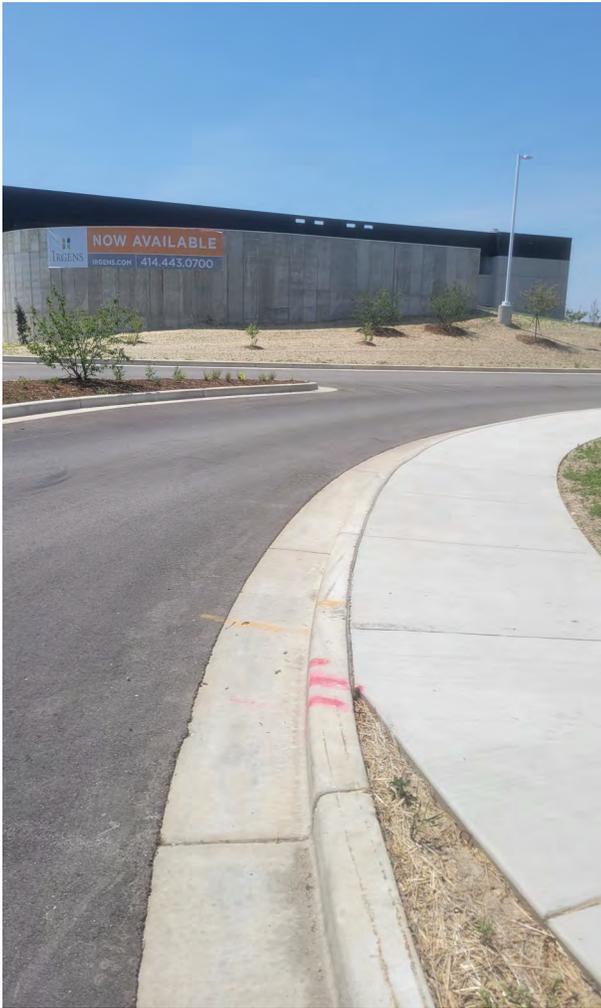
Concrete curb and gutter and sidewalk along the north side of Outlot 3 entrance driveway into the site. Limited greenspace (mulched or grass) within median and along sidewalk. View to southwest; photograph taken on June 1, 2023.
